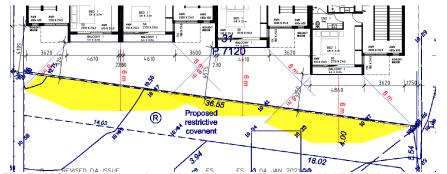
First Floor Plan (above) overlay of the subject site. The section highlighted in yellow shows the cone of vision arc encroachment from the balconies onto the southern adjoining lot.
